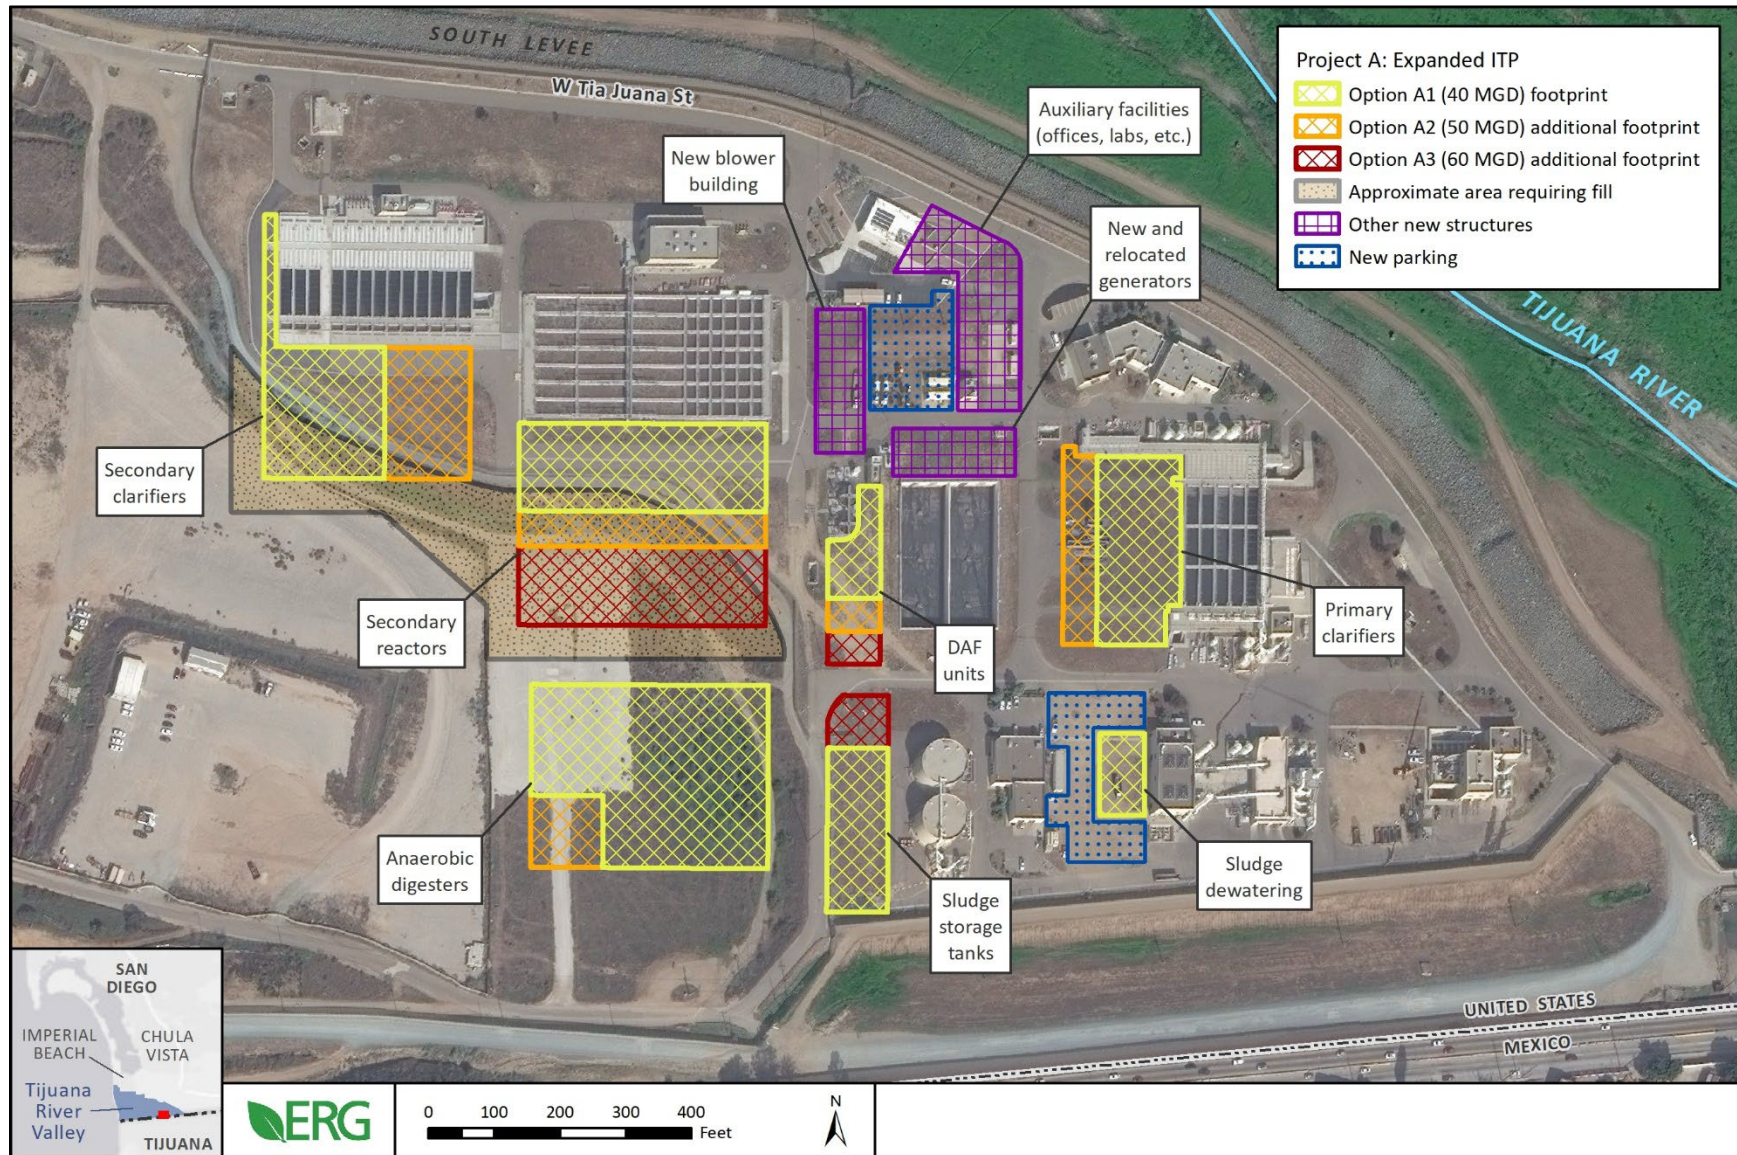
Project A (Expanded ITP) – Conceptual Site Plan of Proposed Facilities
